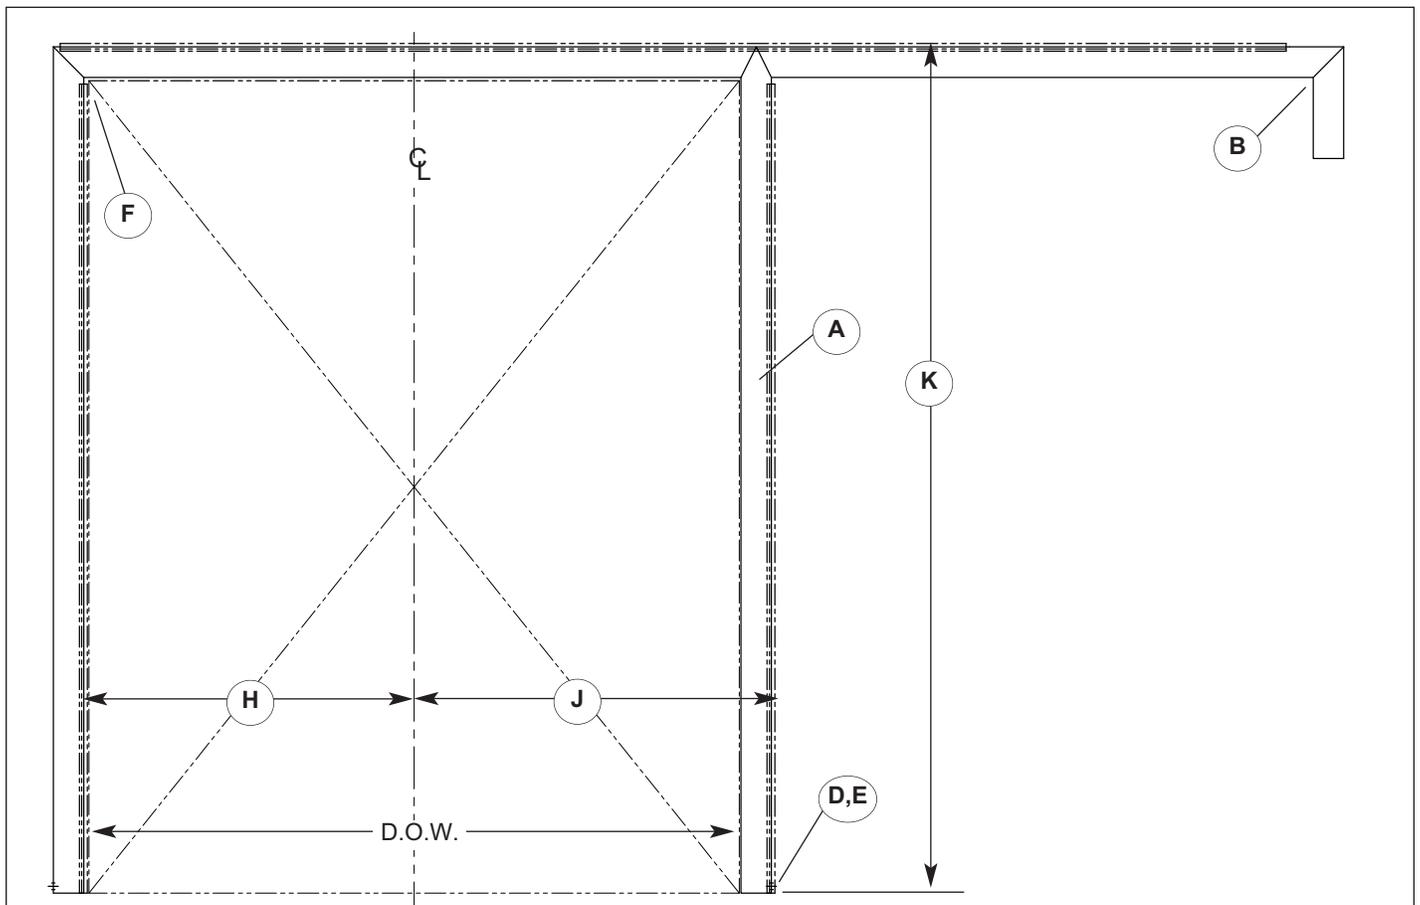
Right Hand Drive w/Right Hand Slide or Left Hand Drive w/Left Hand Slide
